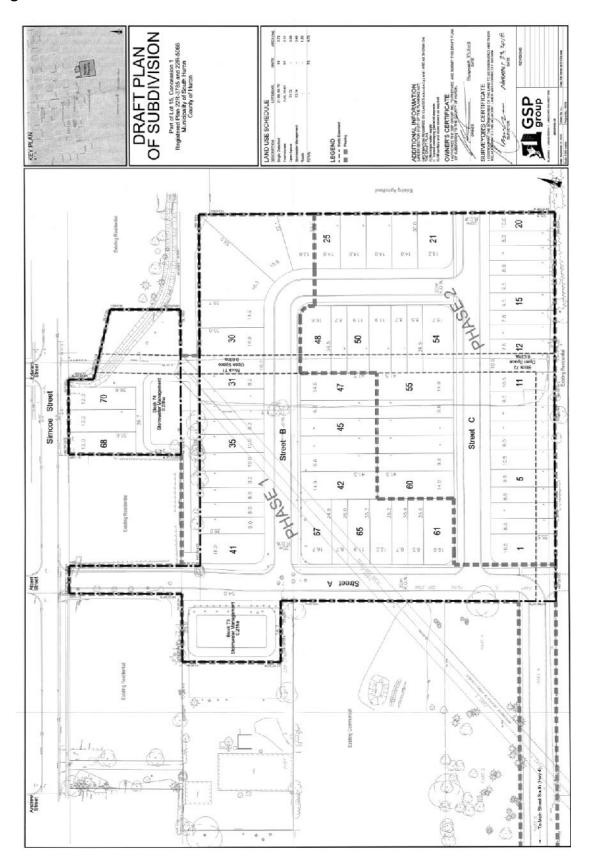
Proposed Plan of Subdivision Access from Simcoe Street
